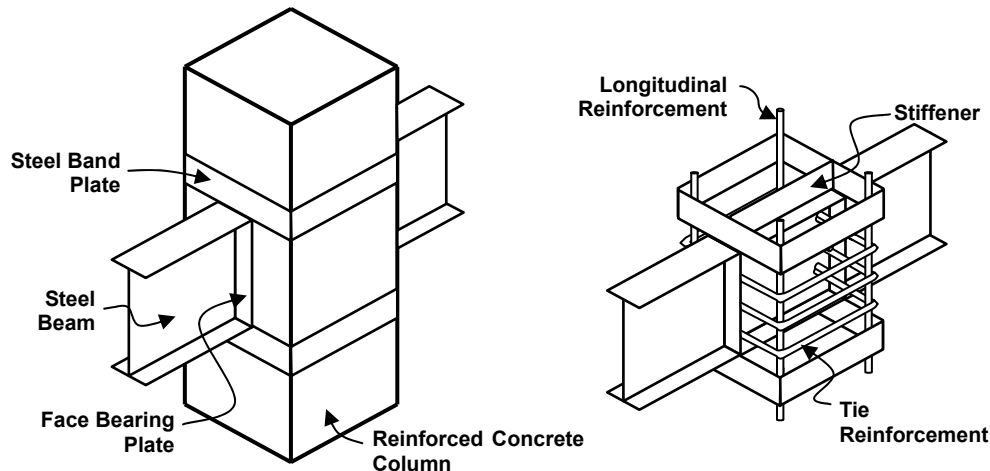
Connection between Steel Beam and Reinforced Concrete Column
